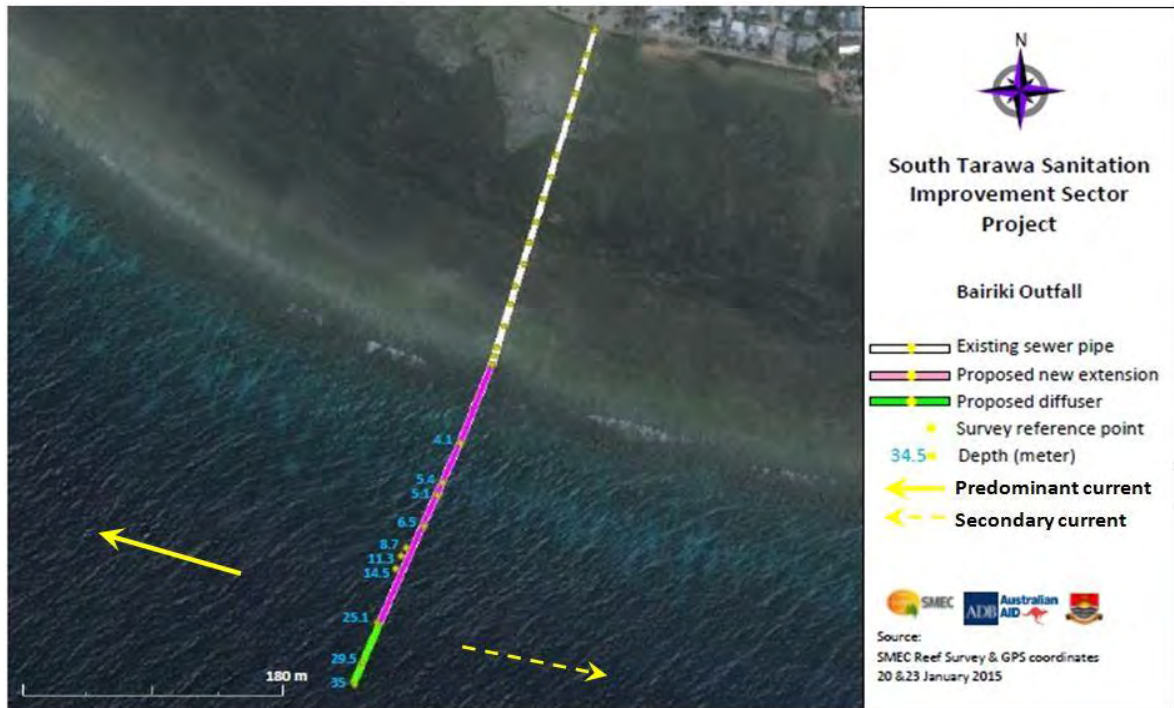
Existing Outfall Pipe and Proposed Extension at Bairiki
